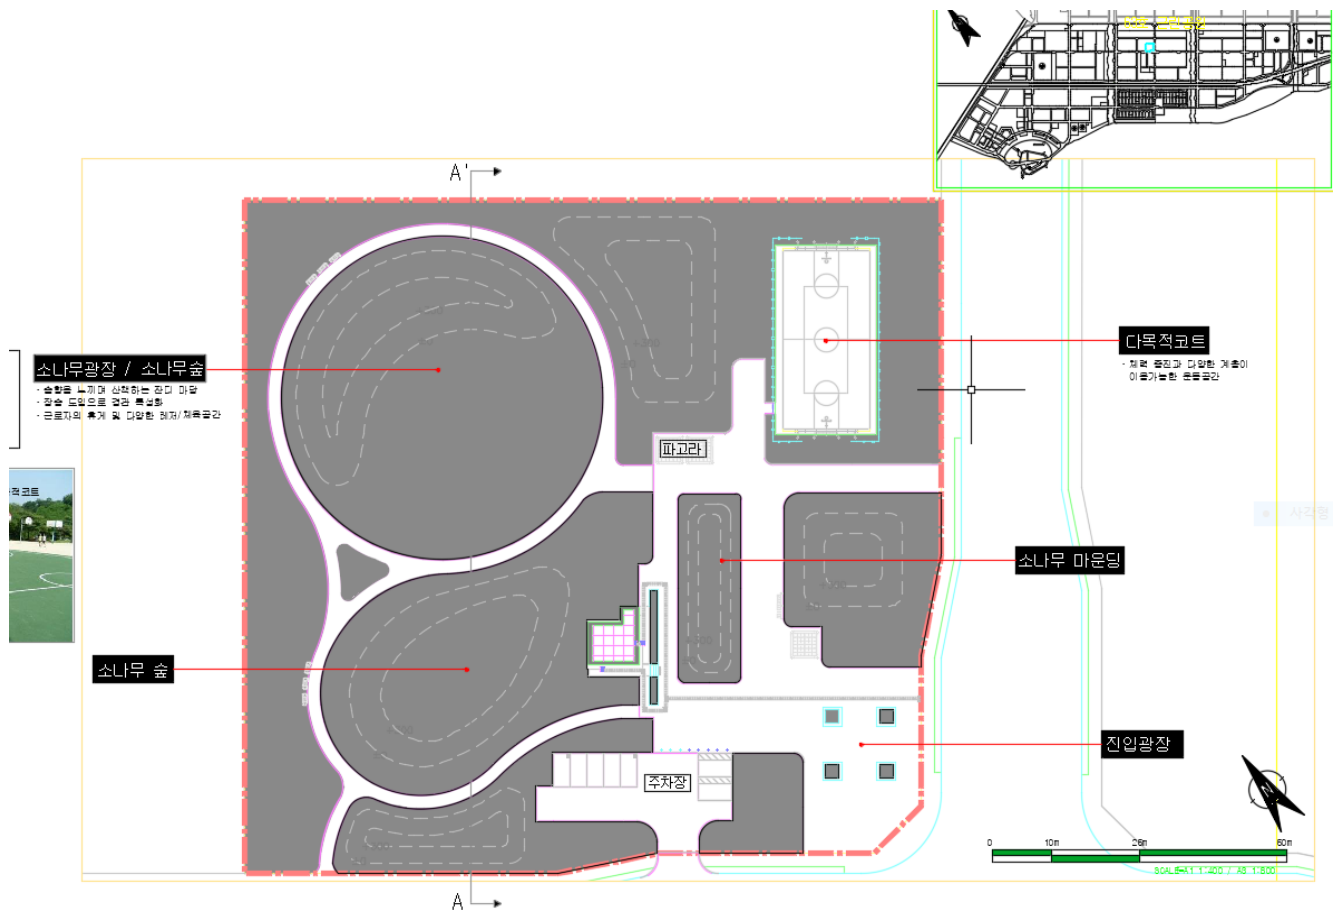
No. 63 Neighborhood Park Location and Floor Plan
